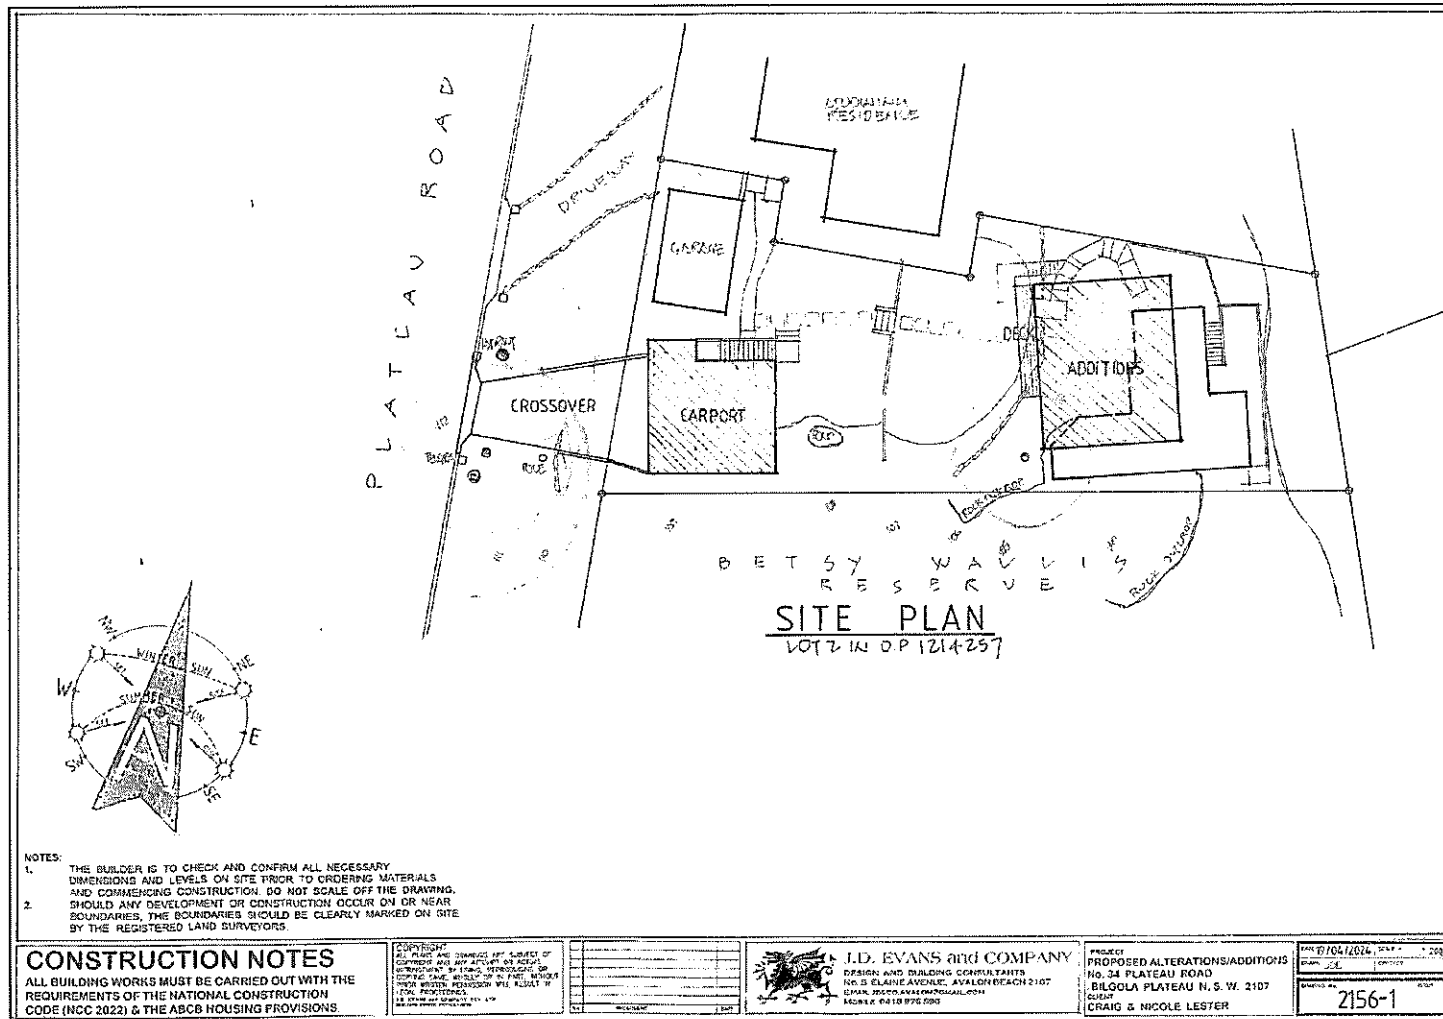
ILLUSTRATES PROPOSED SITE PLAN
